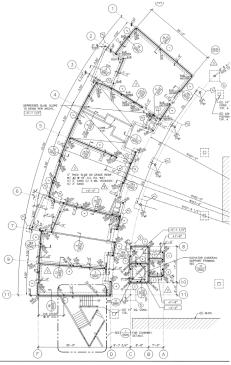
BUILDING 7: 2017 HVAC Upgrade Roof Framing Plan
